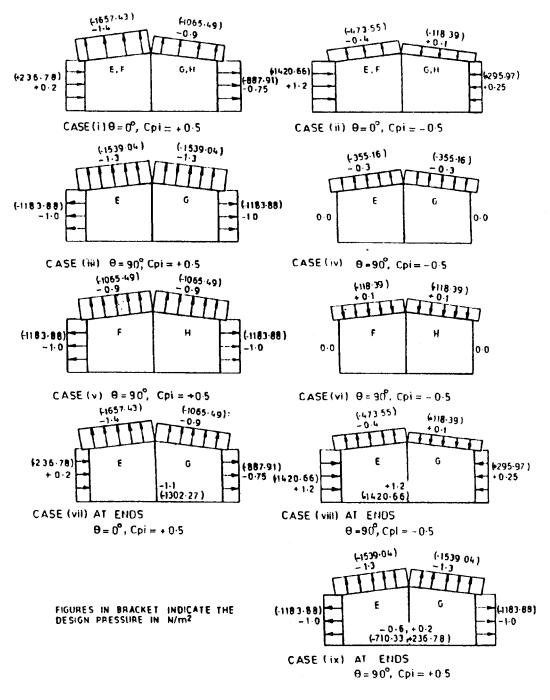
A RECTANGULAR CLAD BUILDING WITH PITCHED ROOF (Continued)
